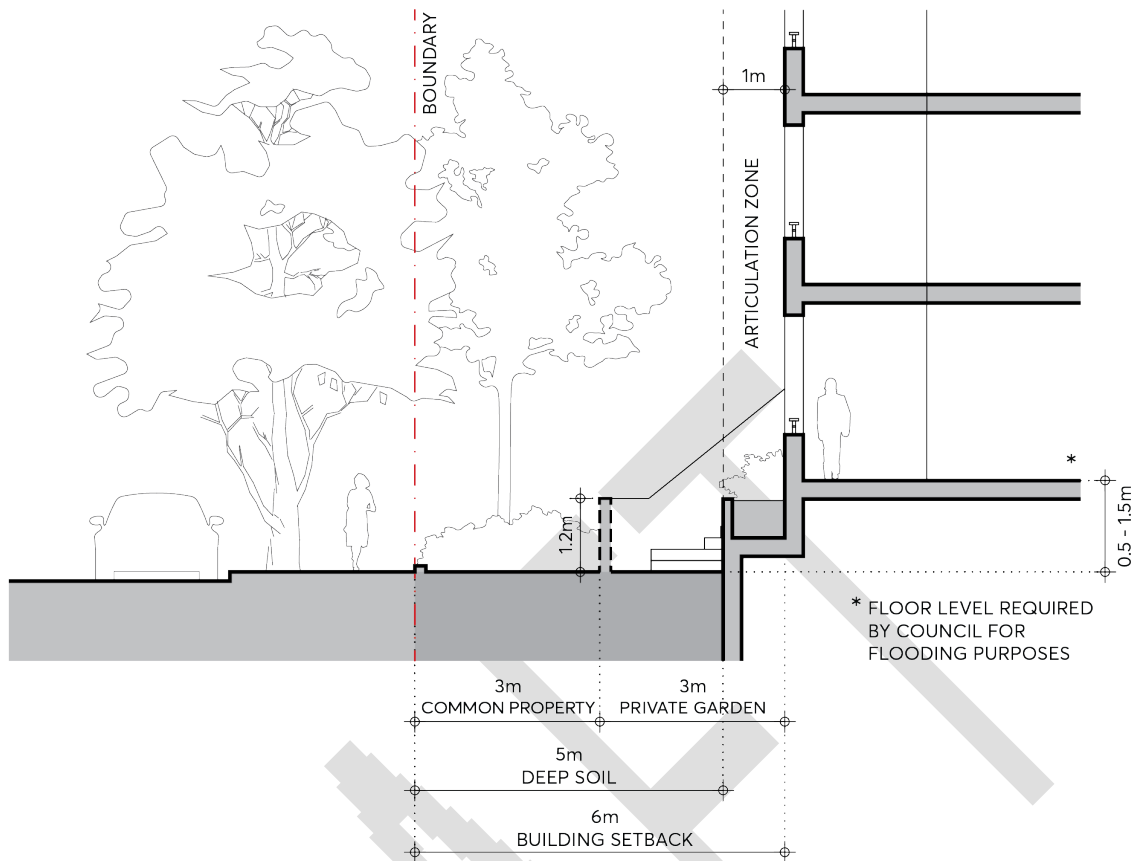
Residential Ground Floor: Floor level required 0.5-1.5m above footpath level
